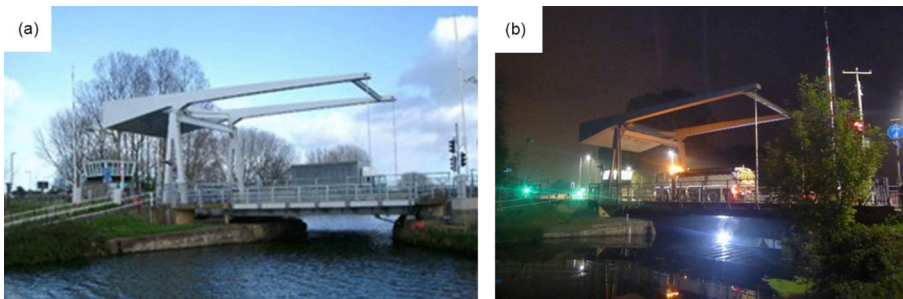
Photo of Bridge 1, (a) west elevation, (b) west elevation with test truck passing in west lane.
